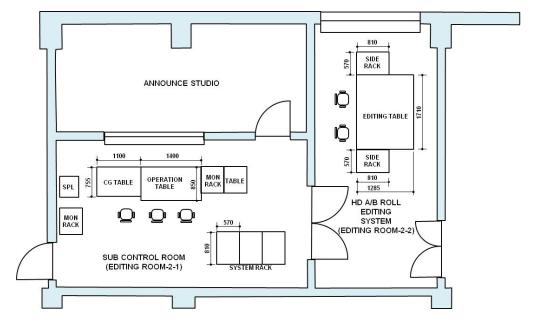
Equipment Arrangement of Editing Room-2-1 and Editing Room-2-2
